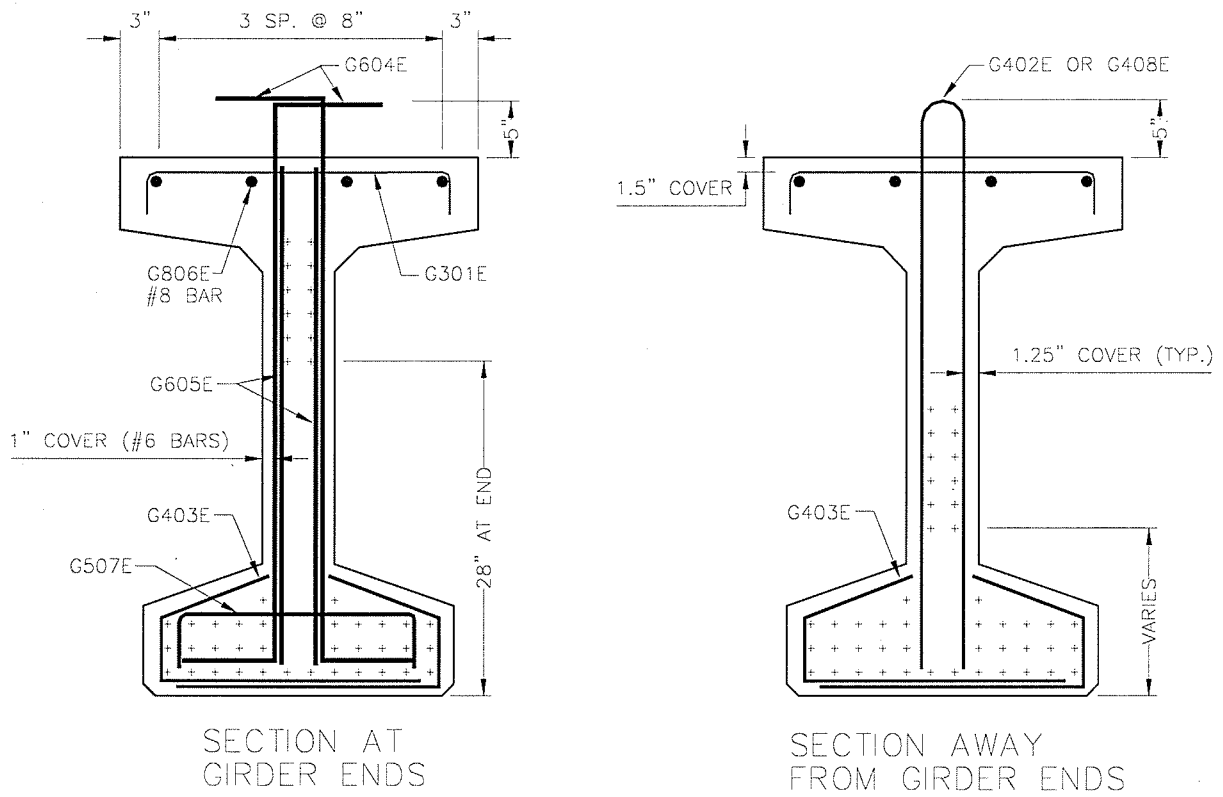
Test Girder Mild Steel Reinforcement, Cross Section
